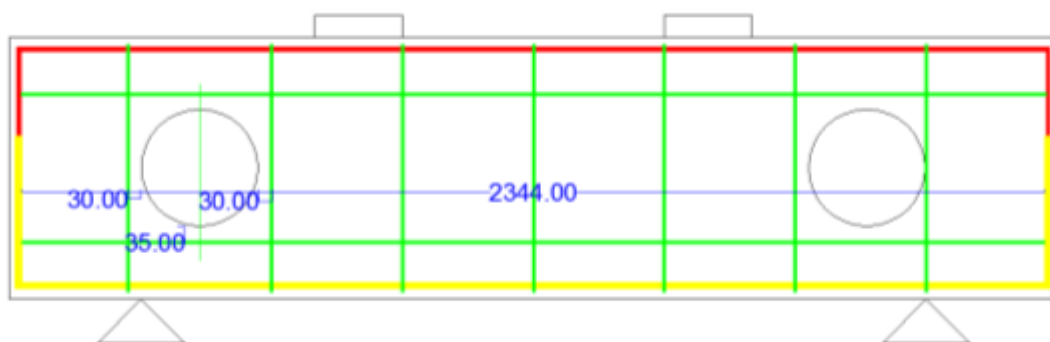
Arrangement of steel reinforcements in deep beam with circular openings
